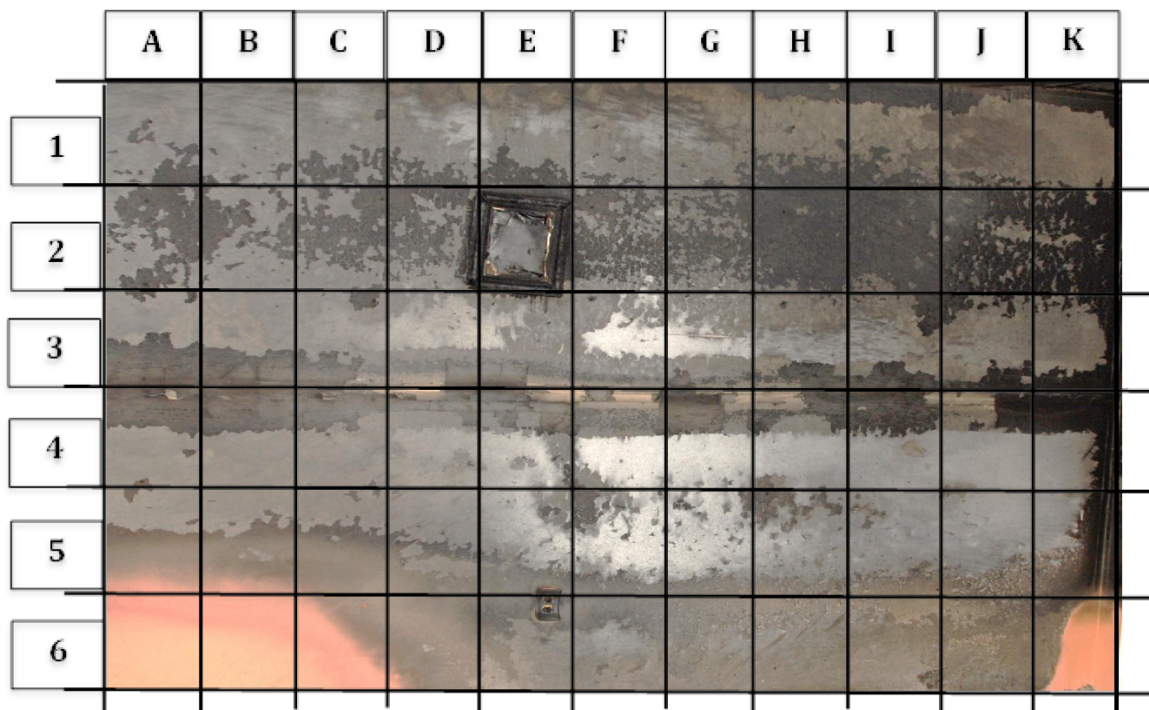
Photograph of damaged wall with superimposed grid.
